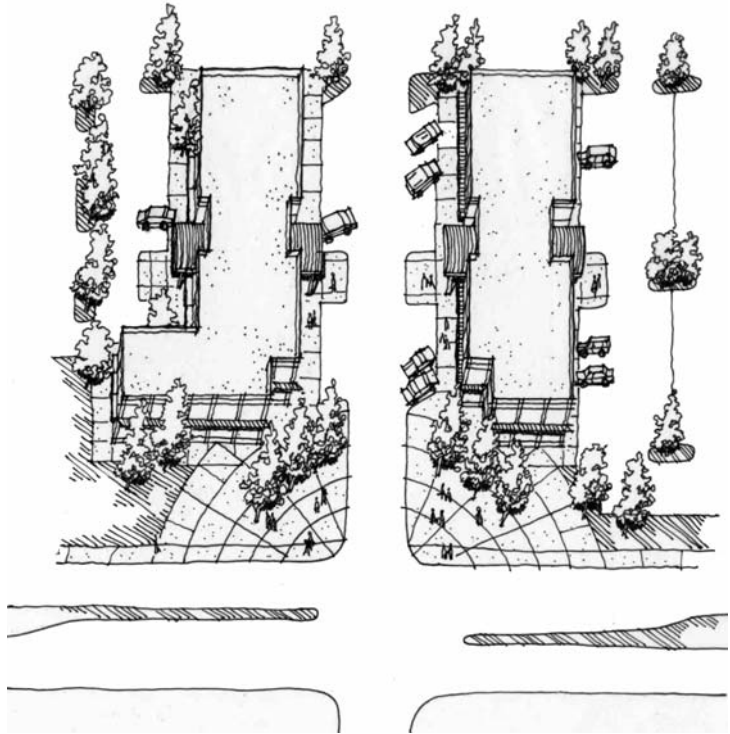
To the maximum extent practicable, pad sites shall be clustered together to define street edges and entry points or to enclose and create interesting places between buildings.
